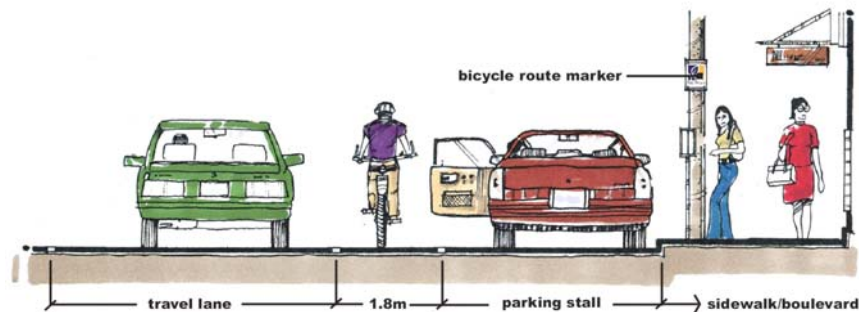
Typical Bike Lane with On-Street Parking
